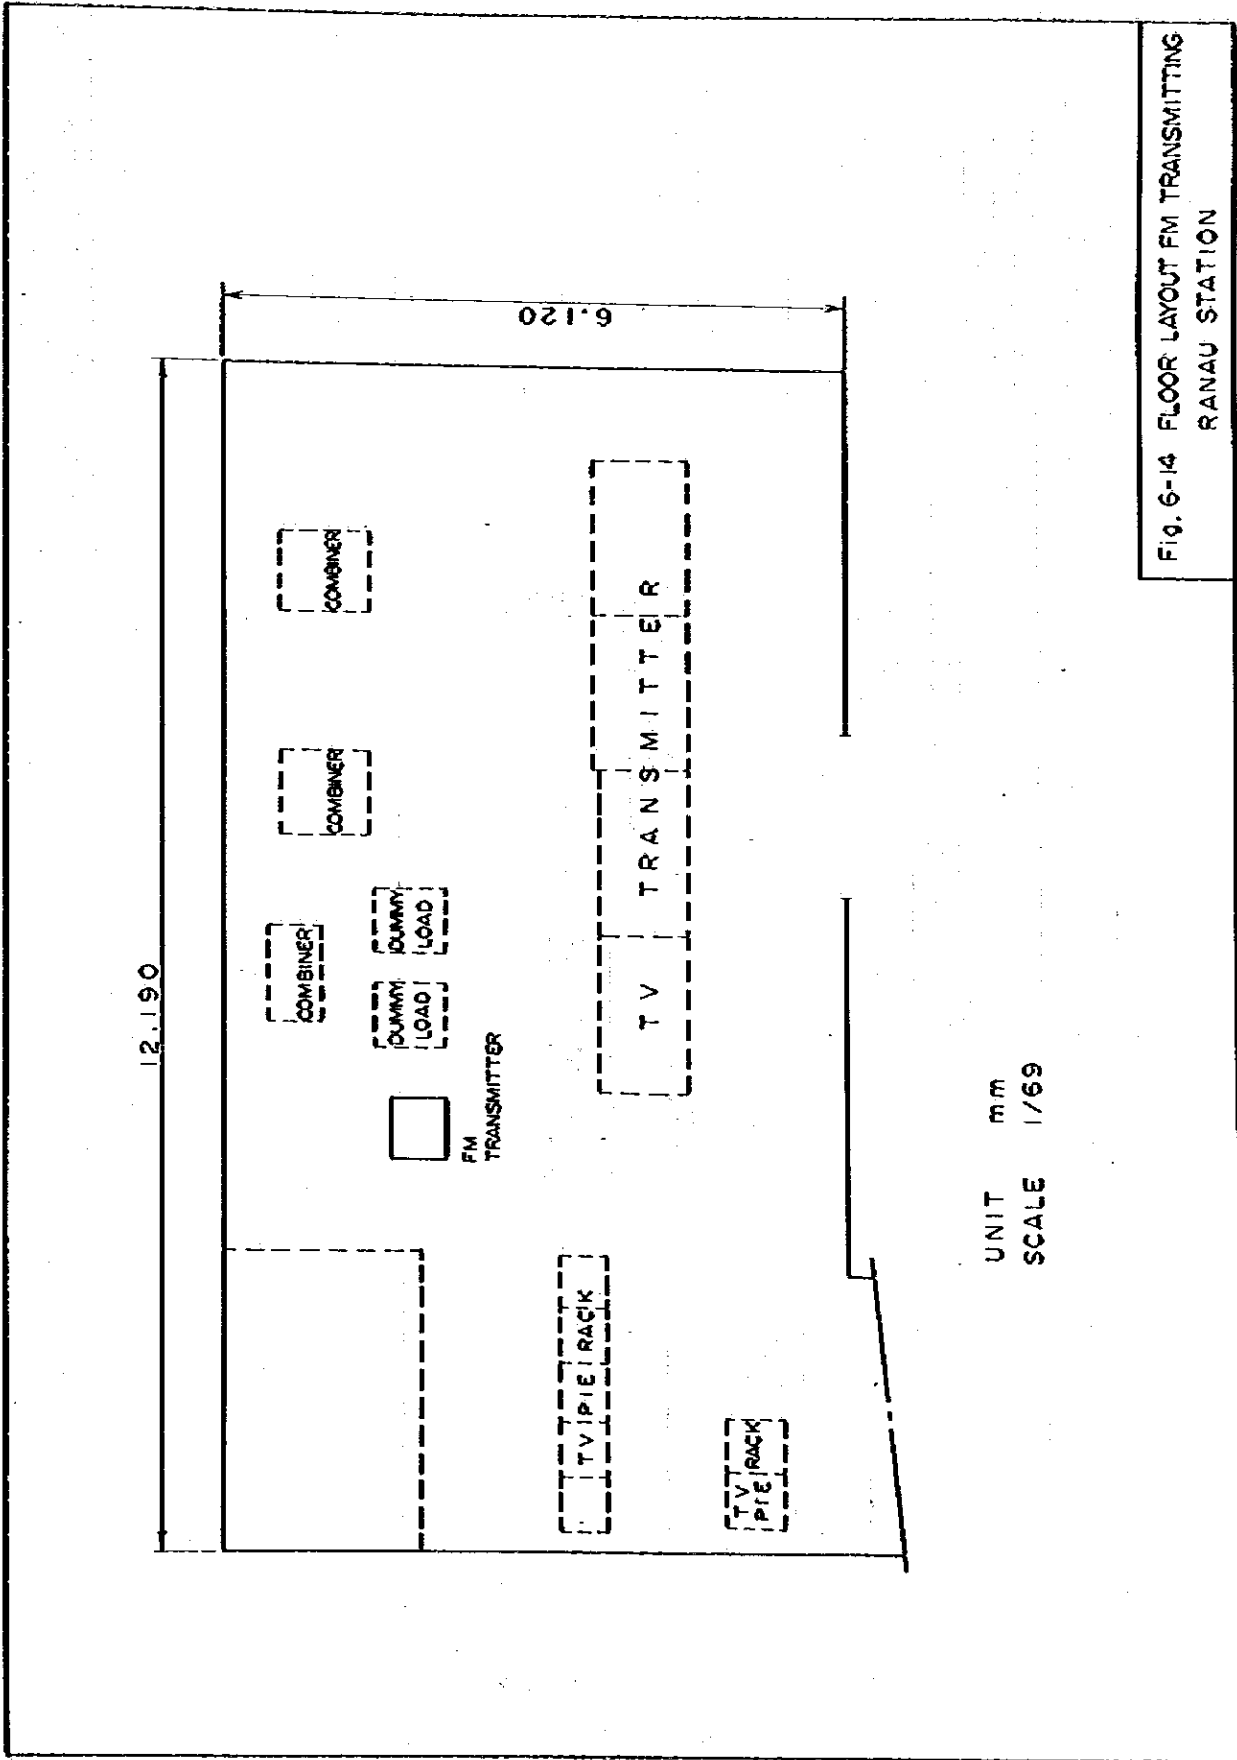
FLOOR LAYOUT FM TRANSMITTING
